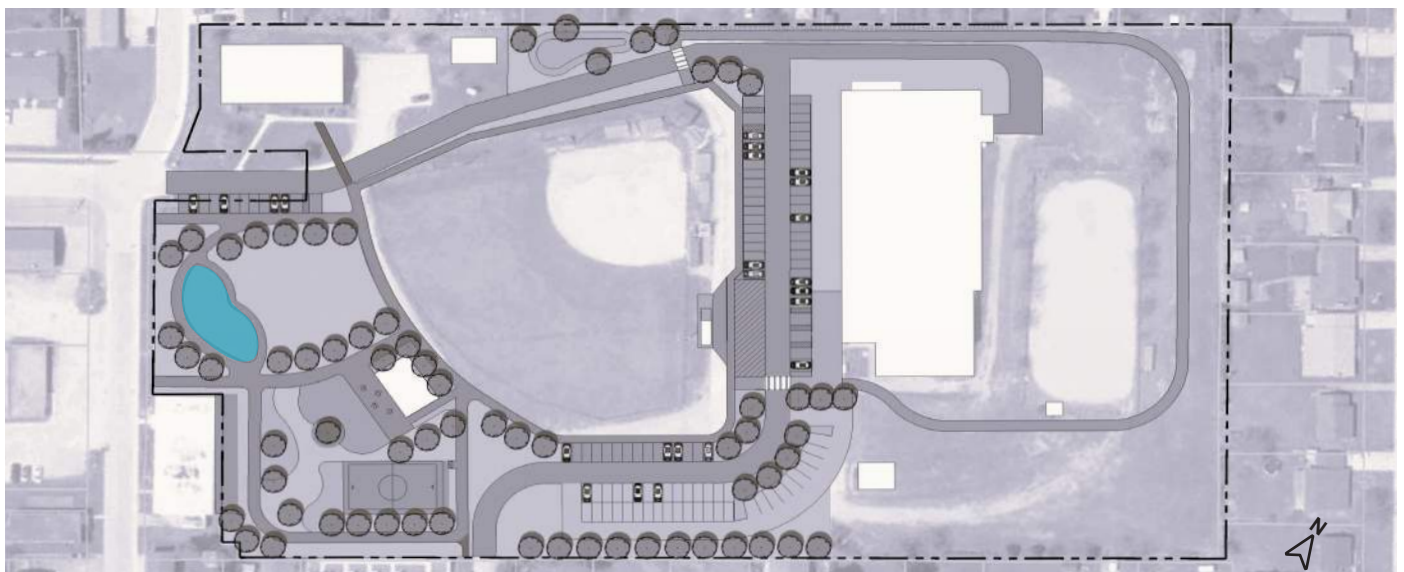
Master Plan Concept Design for Splash Pad and Pedestrian Path Connection
